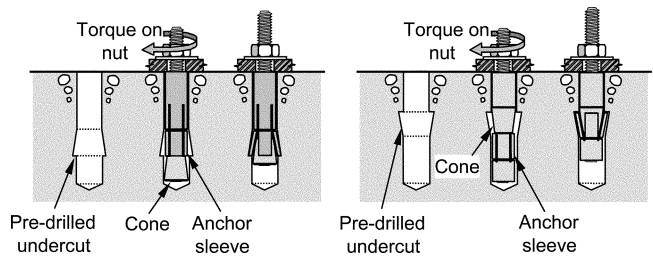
(e)—Type 5 undercut anchor. Torque-controlled anchor set into predrilled undercut by application of torque forcing sleeve over cone (two examples shown).
